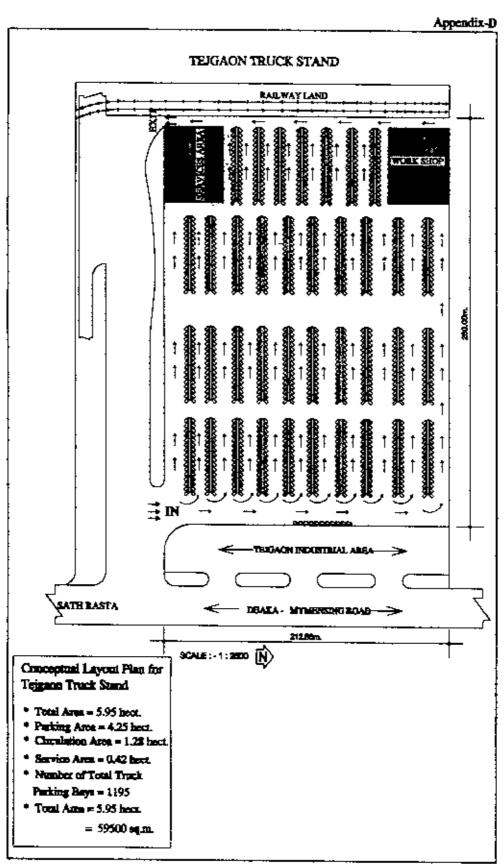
Conceptual Layout Plan for Teigaon Truck Terminal
